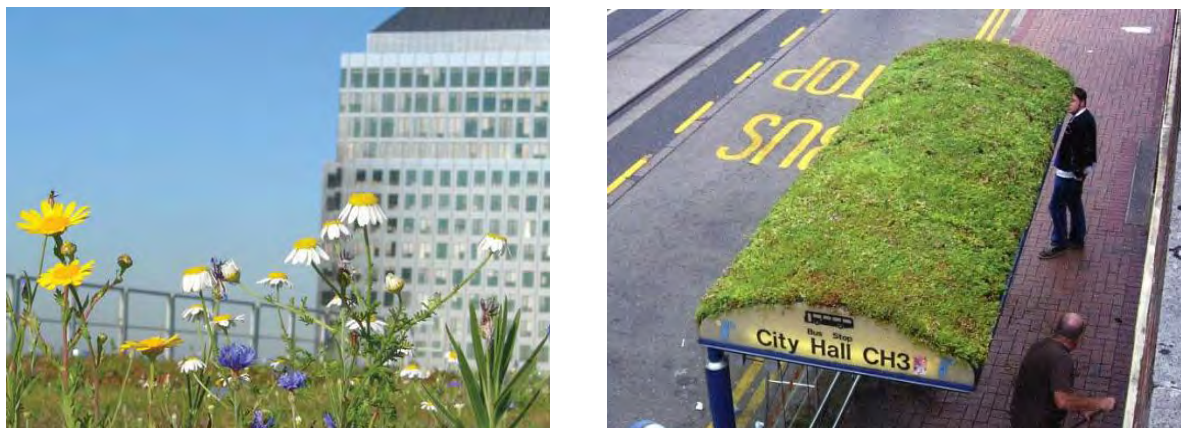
Intensive green roof over a building (left) and extensive green roof over a bus stop sitting (right) (source: CIWEM, 2010)
